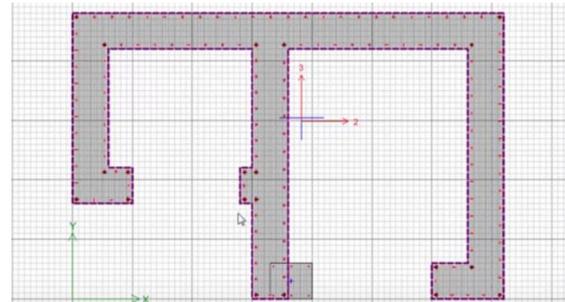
SHOWS THAT PLANE SURFACE OF SHEAR 3D GENERAL WALL
